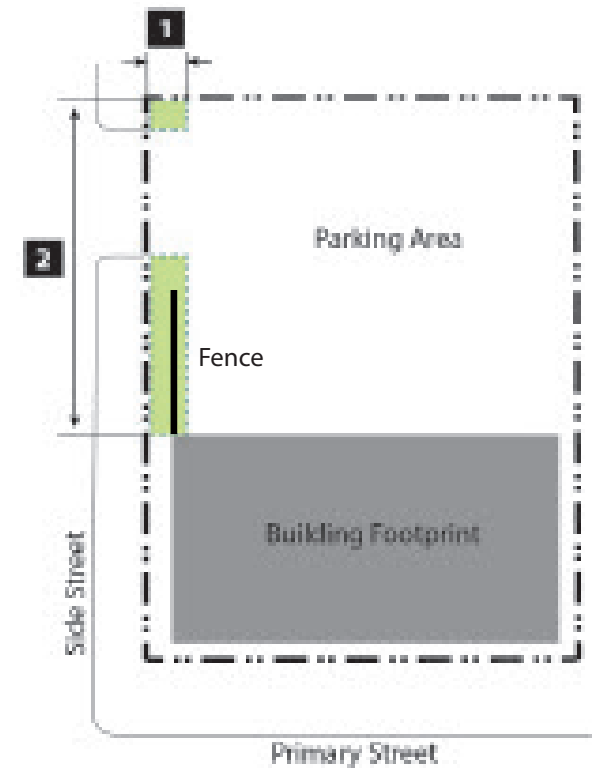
Parking lot frontage buffer diagram. Not to scale.
